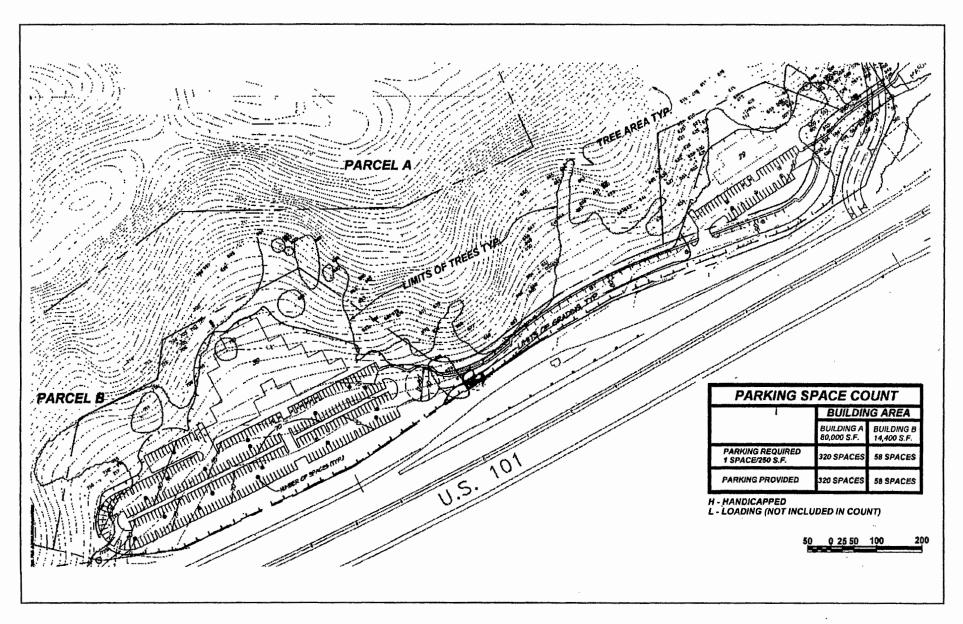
ADMINISTRATION/PROFESSIONAL OFFICE LAYOUT Oakview Master Plan
